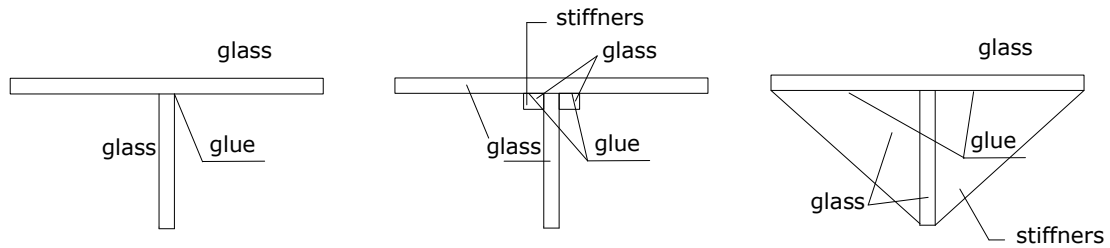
Multilayered glass panel and glued connection in T cross-sections.
